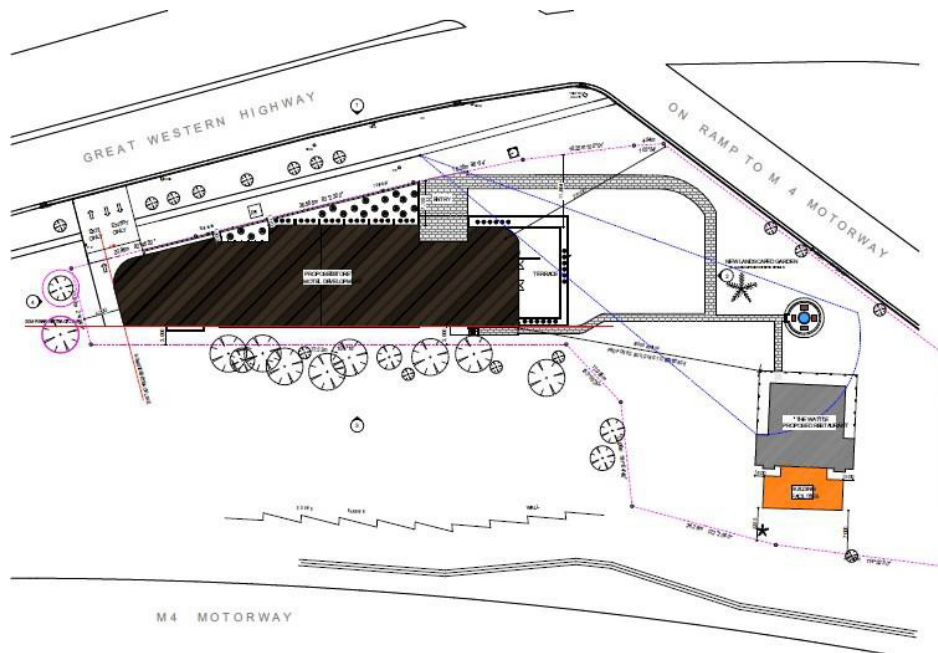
Revised concept layout plan – ground floor (version G dated 2023)
